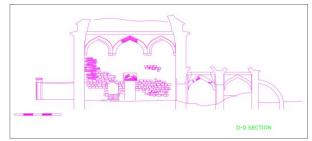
Plan Havsa Sokollu Bath, section D-D (Endowment office Edirne, 2012).
